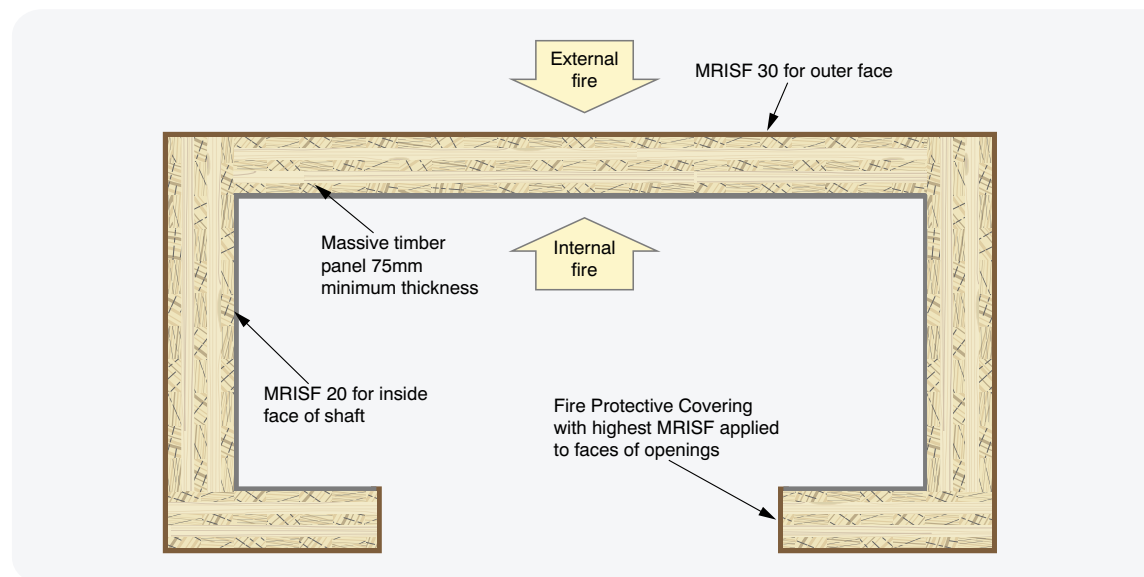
MRISF requirements for typical stair and lift shaft construction for single skin massive timber panel construction.
